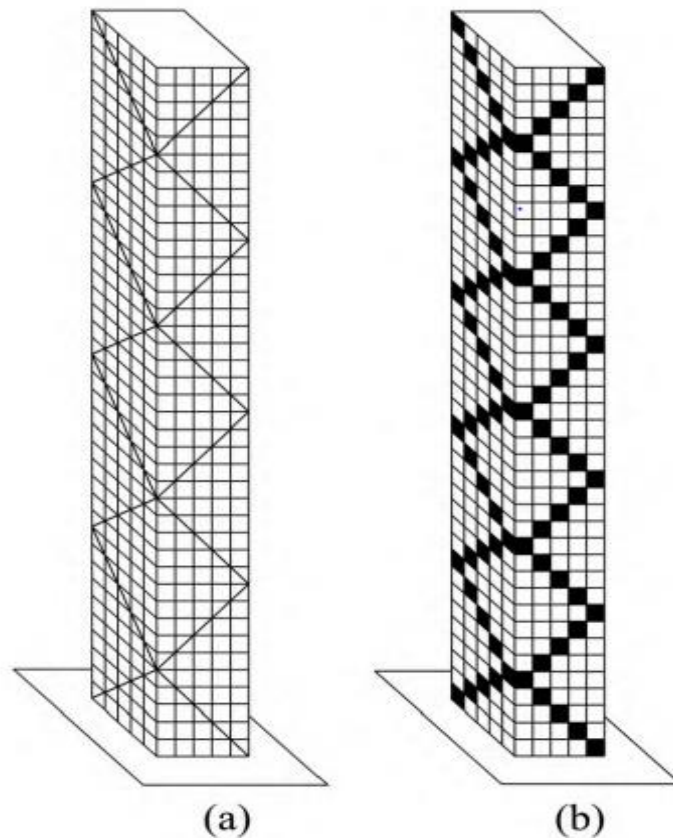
Trussed-tube system: (a) Steel or composite, (b) Reinforced concrete (Taranath, 2010).
